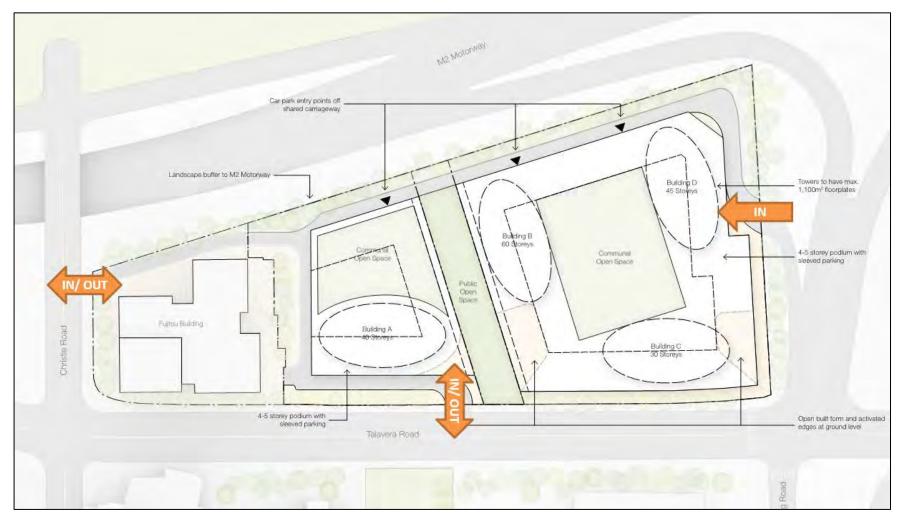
Site concept plan (Source: SJB Architects, May 2017)
